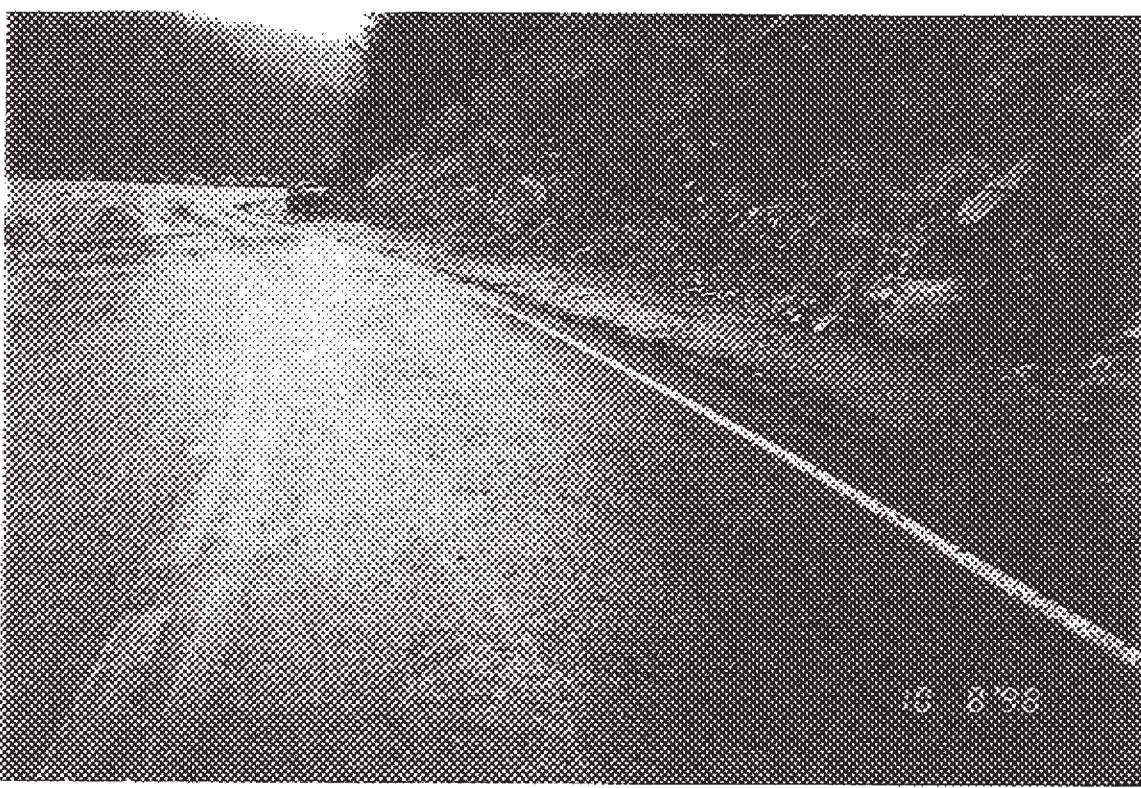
MP 5.60 - Paved ditch, looking back
